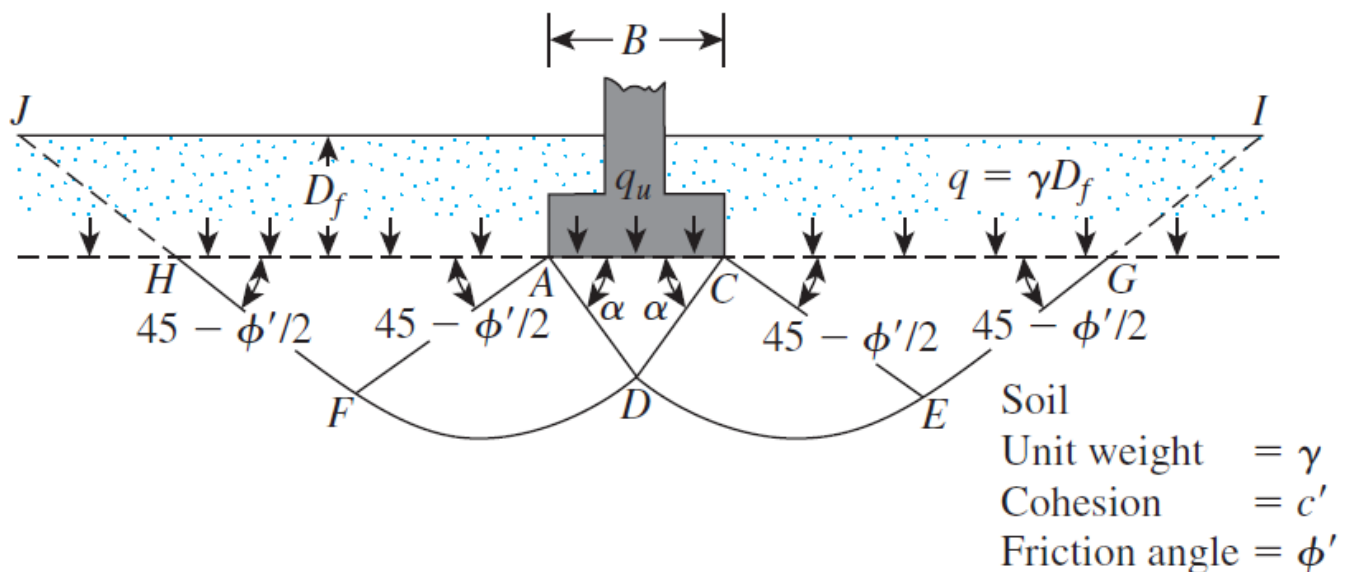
Bearing capacity failure in soil under a rough rigid continuous (strip) foundation
